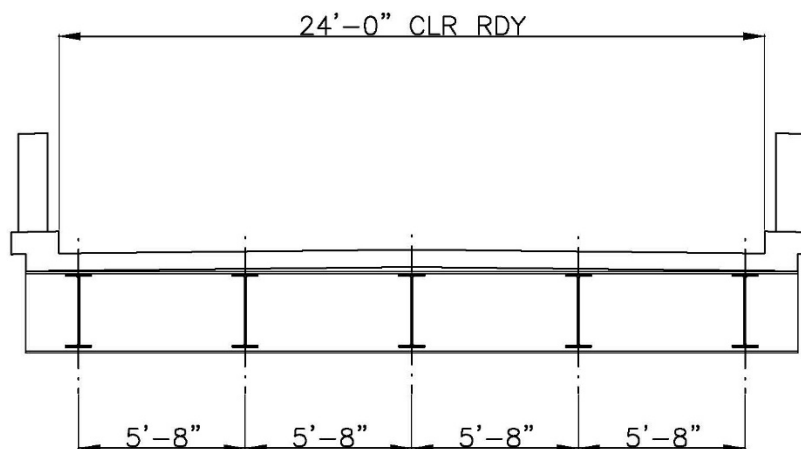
Typical Section of Existing Tower Bridge Superstructure
